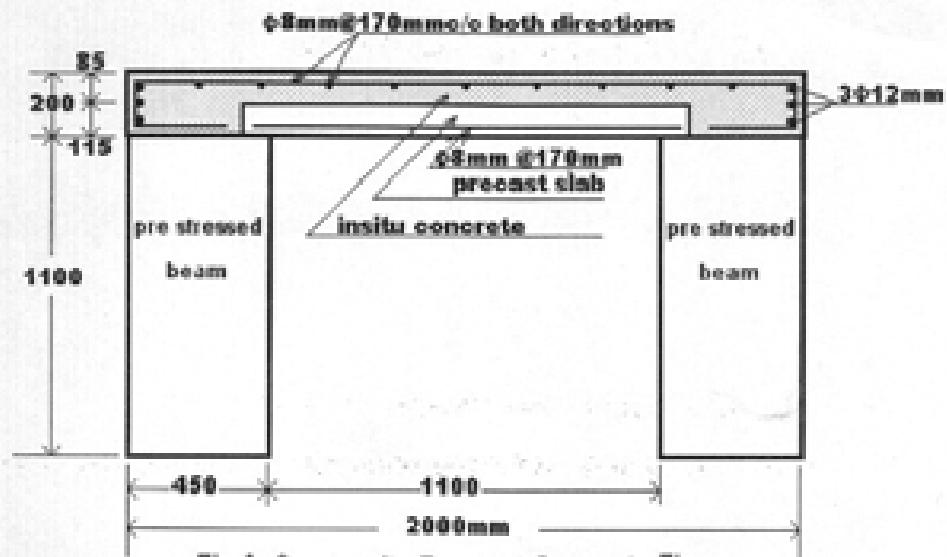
Composite Pre-cast Concrete Floor Reinforcement Details
